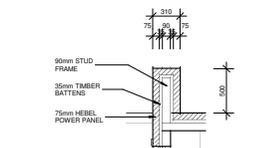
OF NCC 2022 - SEPARATING WALL CONSTRUCTION
